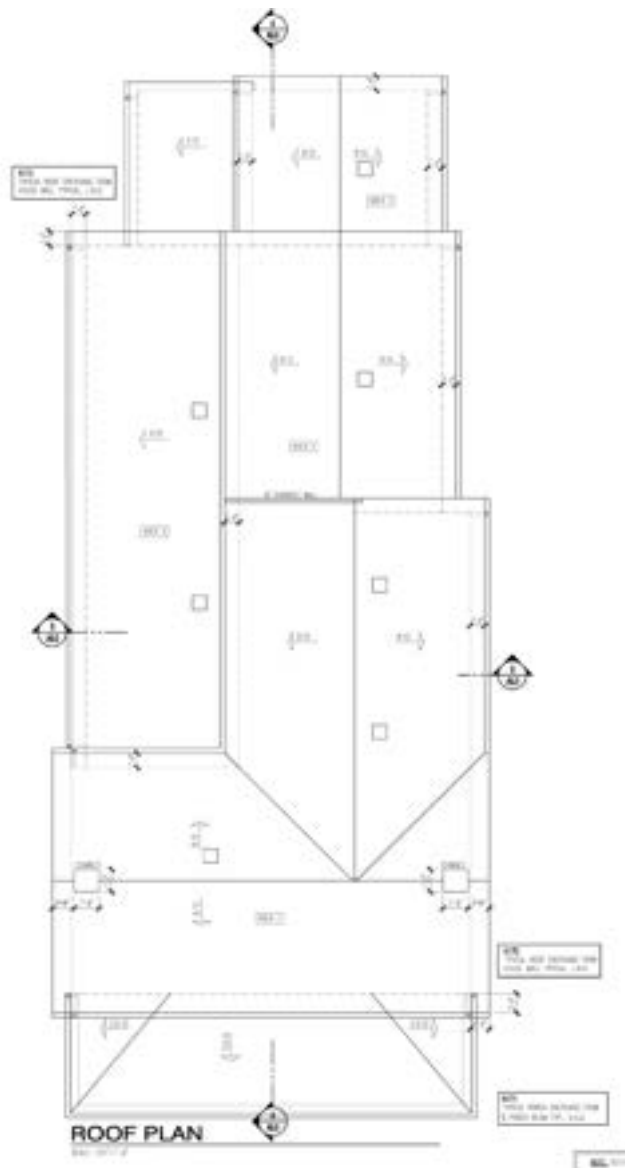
The roof plan provided as part of this submission. The location of the chimneys has been slightly altered from the previously approved shown on Figure 4, and gutters have been added.
